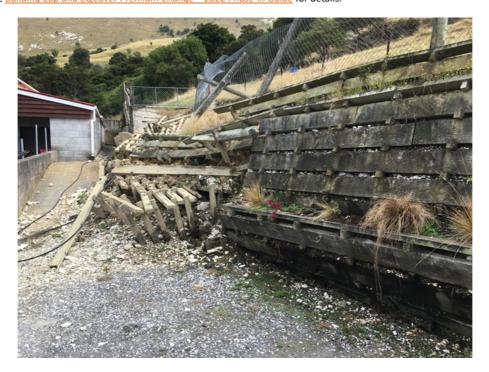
Timber crib retaining wall that has collapsed due to earthquake
